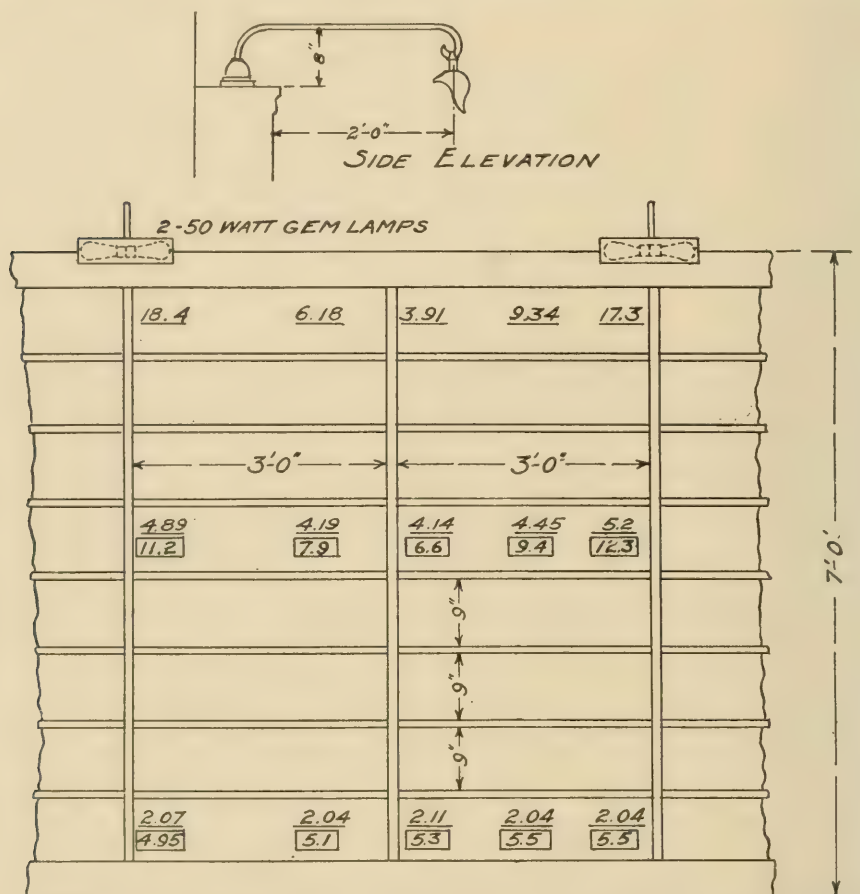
First Floor Illumination, all Local Lamps Being Extinguished.
